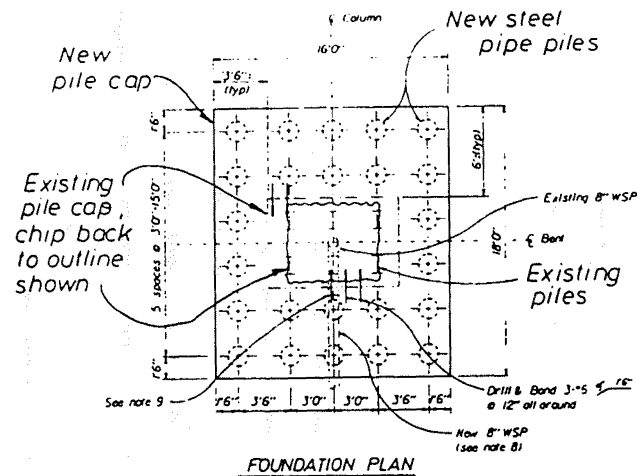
Details of foundation strengthening using new pipe piles and a new pile cap [Zelinski 1993].
